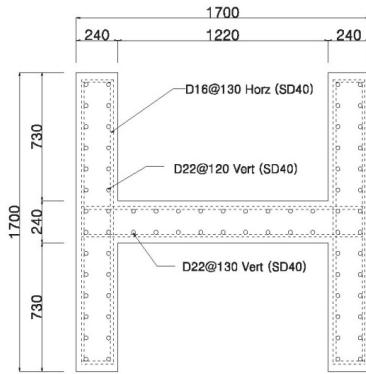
Shear wall configuration and dimensions of the Rebar Configuration (Unit: mm)
